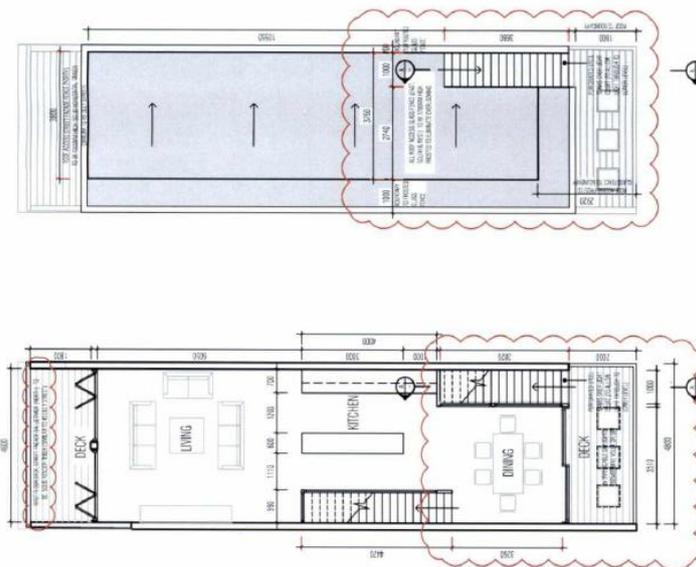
The endorsed first floor and roof plan of 33 Spensley Street permitted by Planning Permit PLN18/0101
